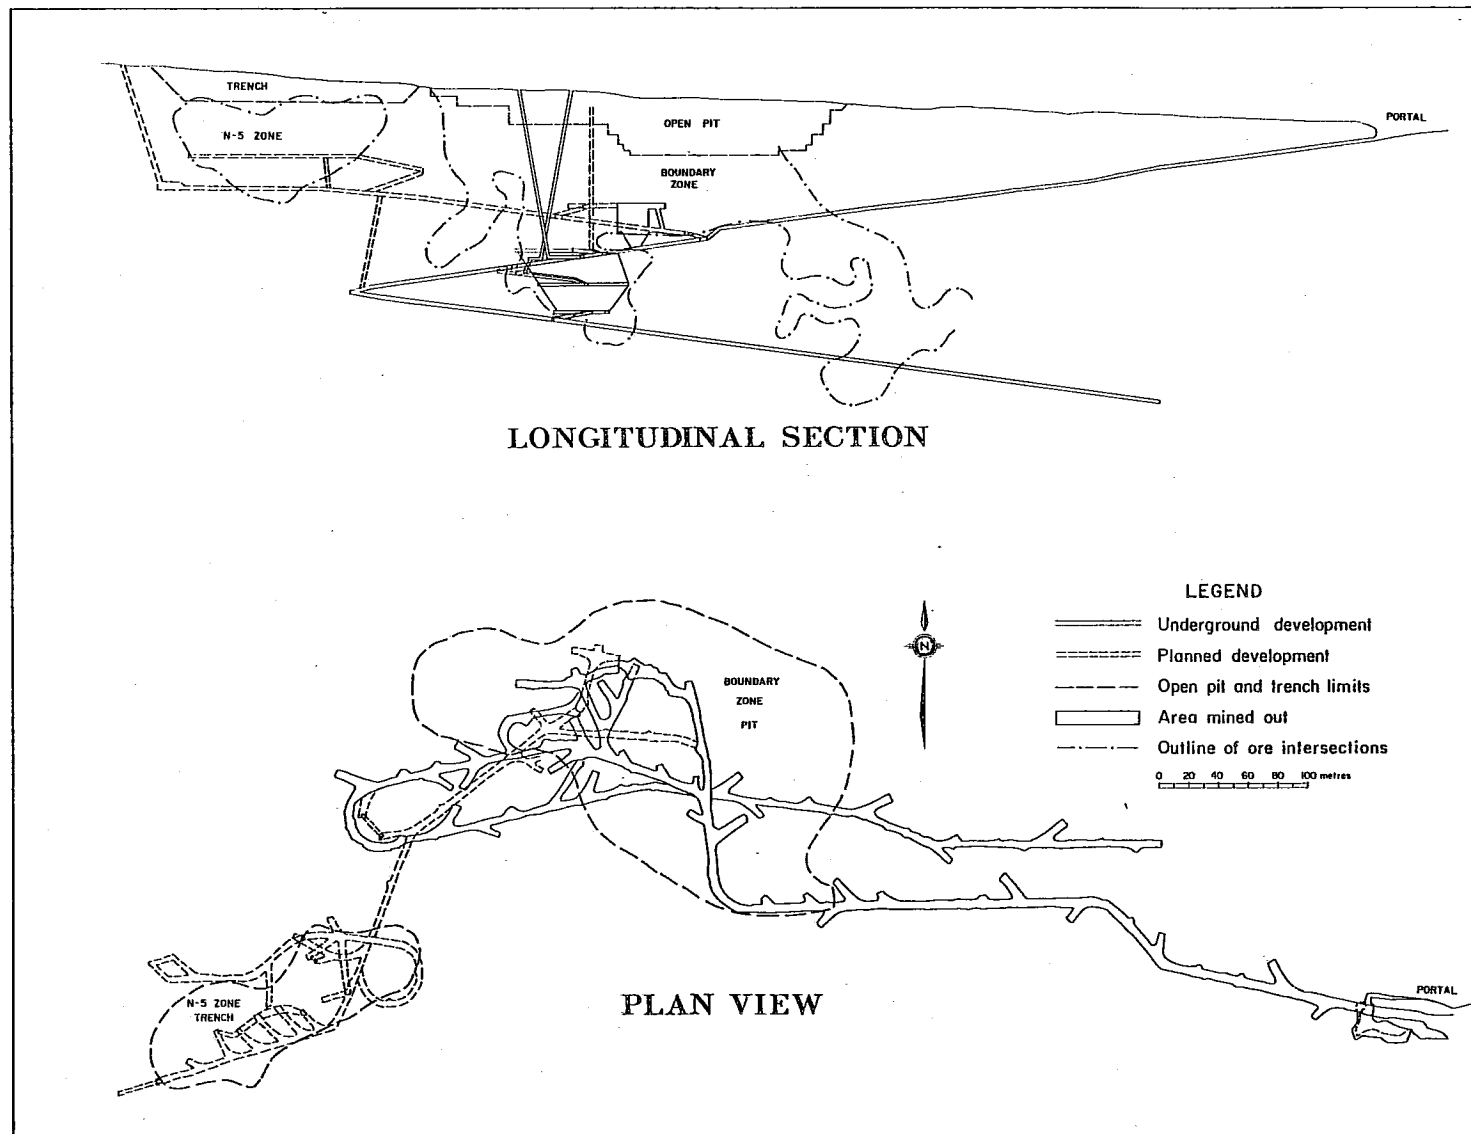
Plan view and longitudinal section of the Stratmat Boundary and Heath Steele N-5 zones.
